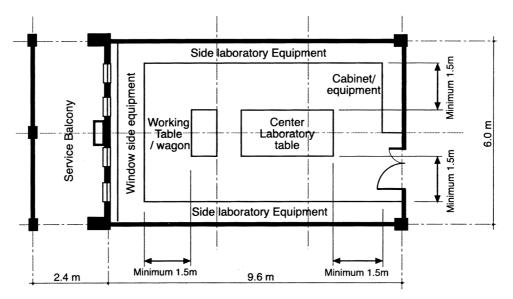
Basic Concept on the Layout of the Laboratories
